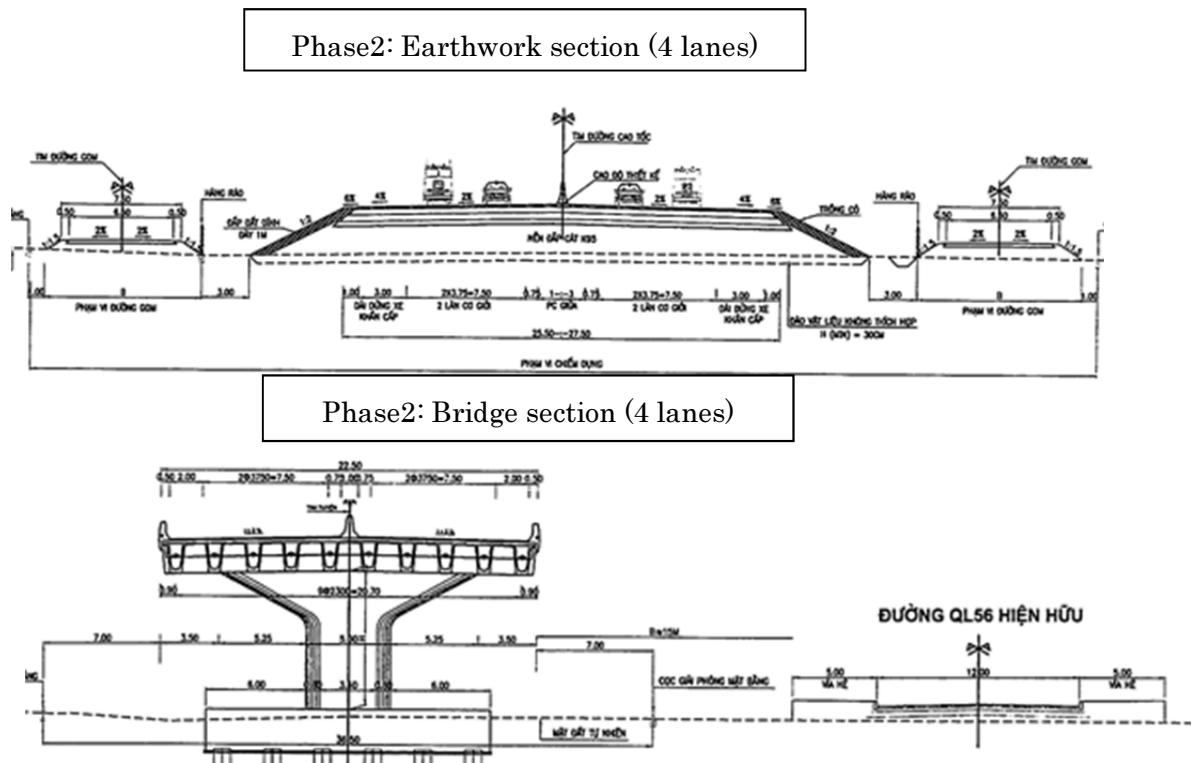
Typical Cross Section of Phu My IC (Km37+600)-NH51 intersection (Km37+600)
